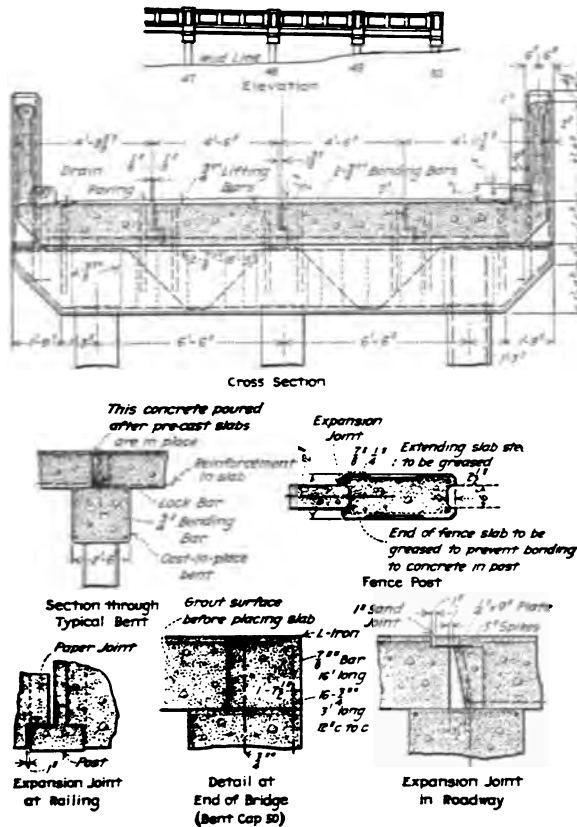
Details of pile trestle across the Miles River near Easton, Md.
